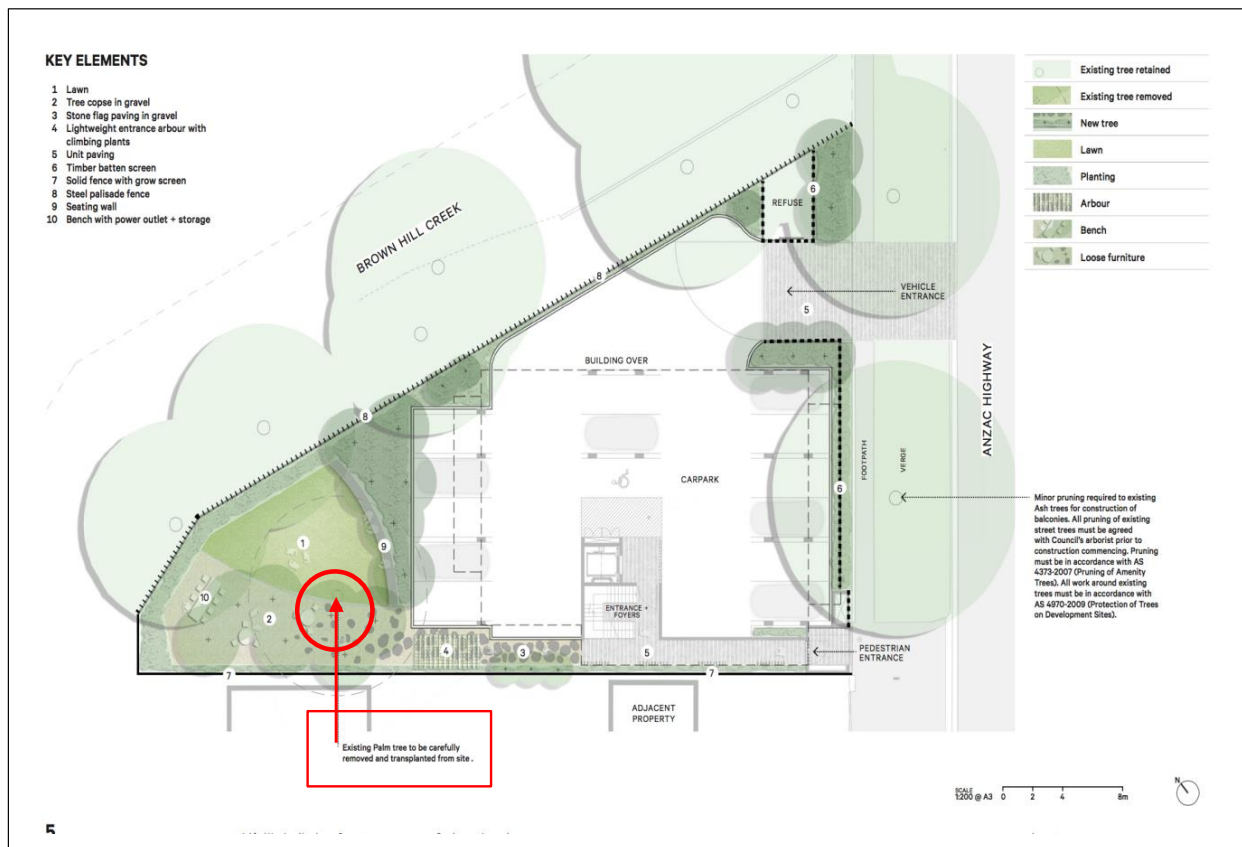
shows the proposed plans for the vacant allotment at 81 Anzac Highway, Ashford SA 5035.
